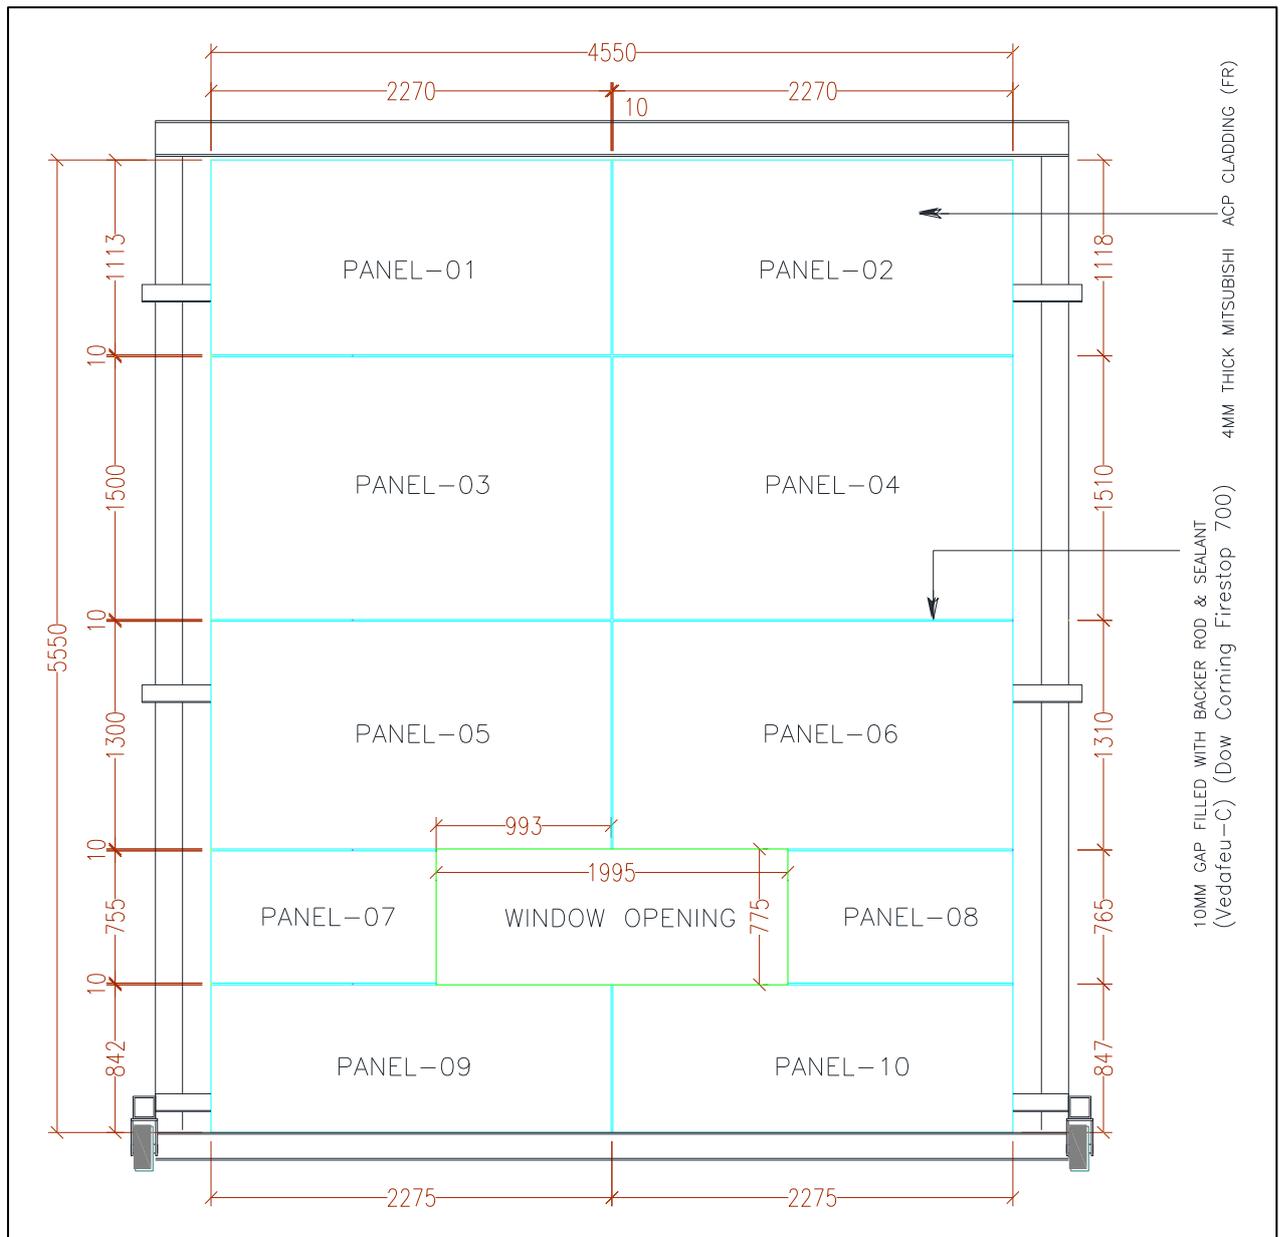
Elevation showing the arrangement of the horizontal and vertical cavity barrier.
